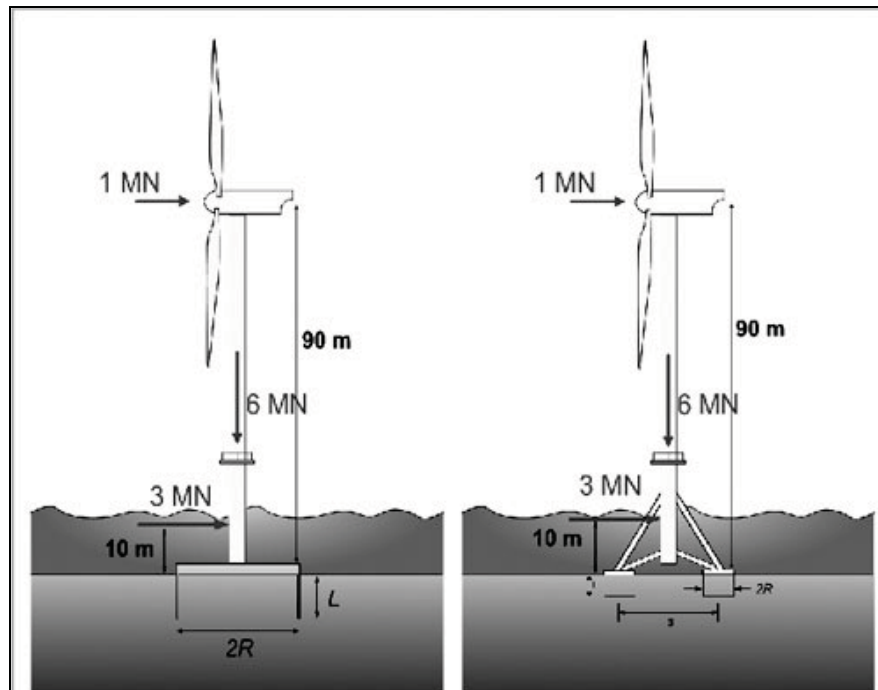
Suction Bucket Alternatives for the Monopile and Tripod Foundations⁴²
